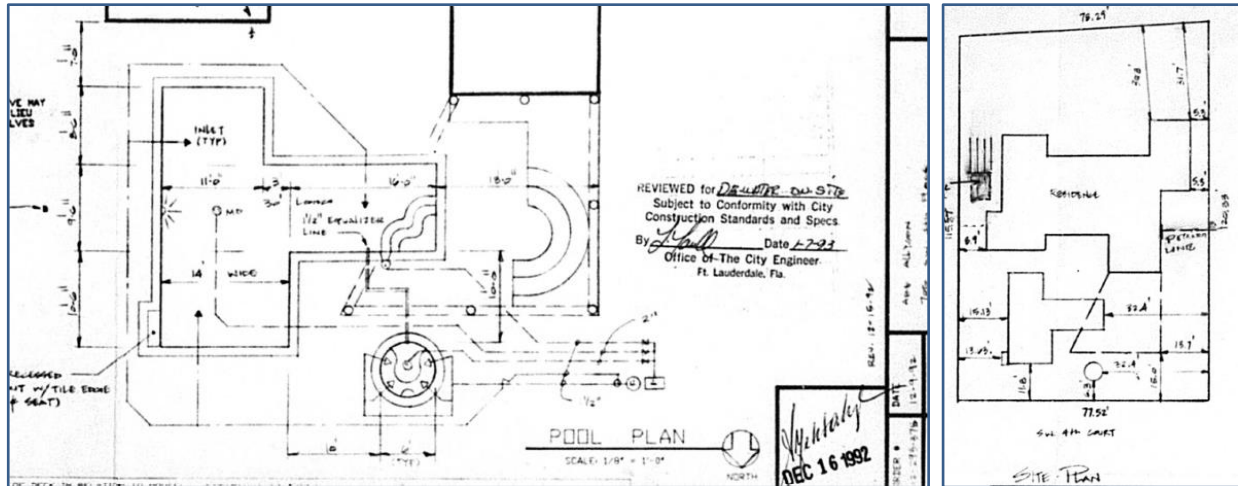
Pool Plan Showing Locations of Pool, Spa and Concrete Benches
